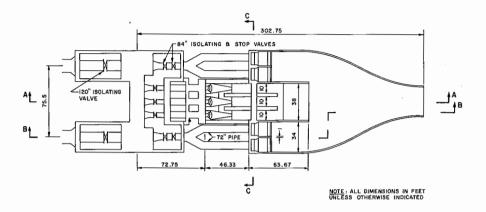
A — The Warragamba Pipelines Stilling Basin - Plan
